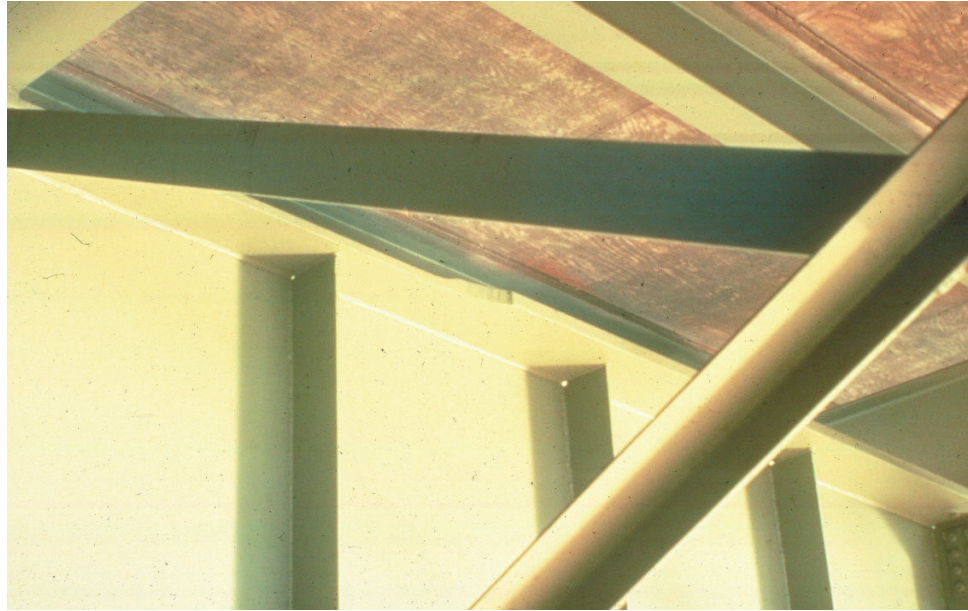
Web Stiffeners and Welded Flange Splice
